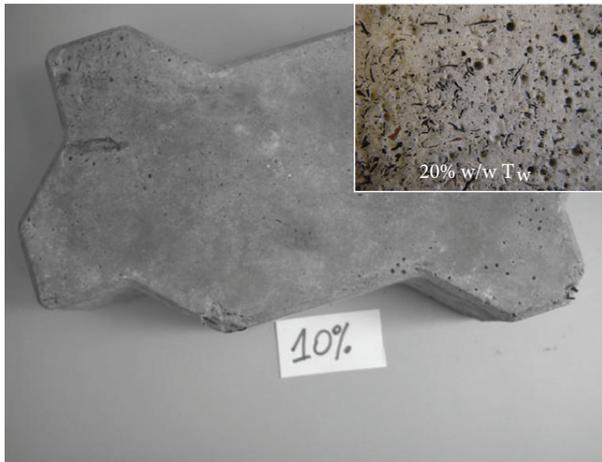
Paver block with 10% w/w Tw concrete mixture. The paver surface view of 20% w/w Tw concrete mixture is shown in detail.
